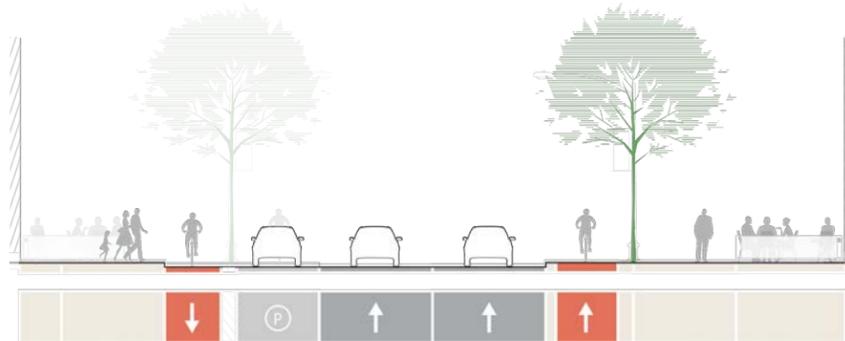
Cross Section Alternative - Bike Lanes, Parking and Loading within curb inset
